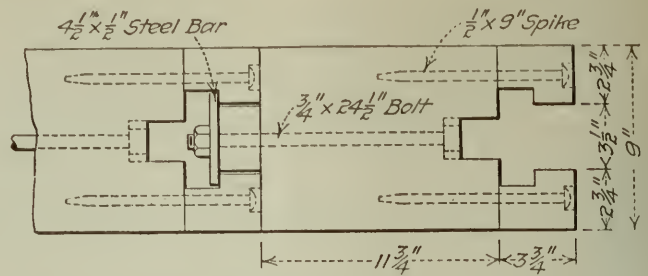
CROSS-SECTION OF WOOD SHEETPILE AT NAVIGABLE PASS
